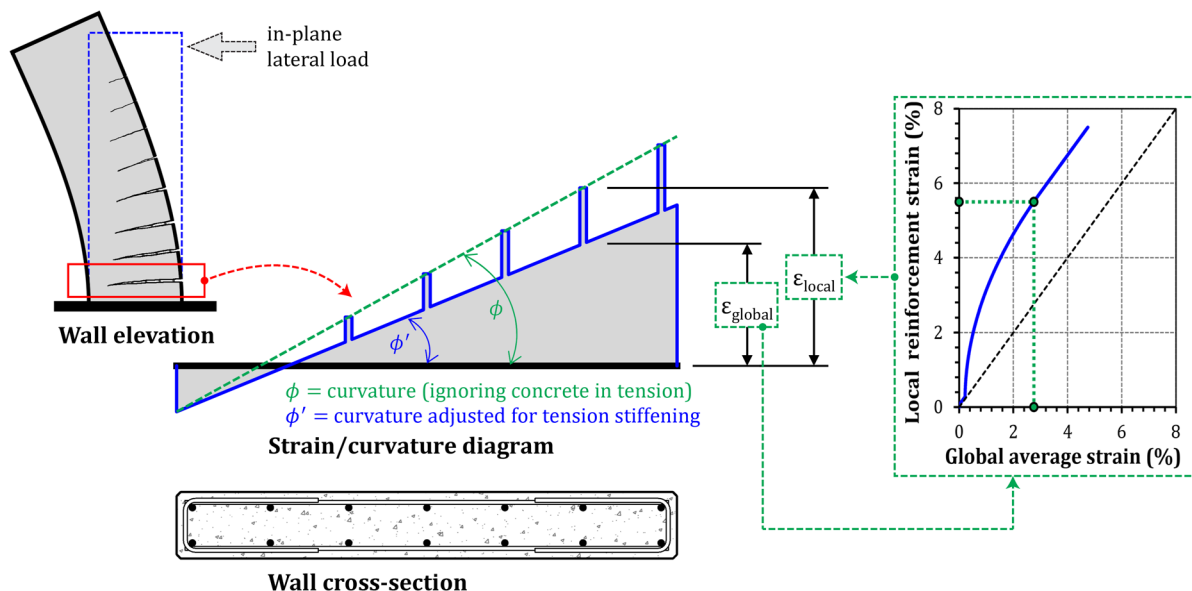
Tension stiffening in RC walls subject to in-plane loading.
